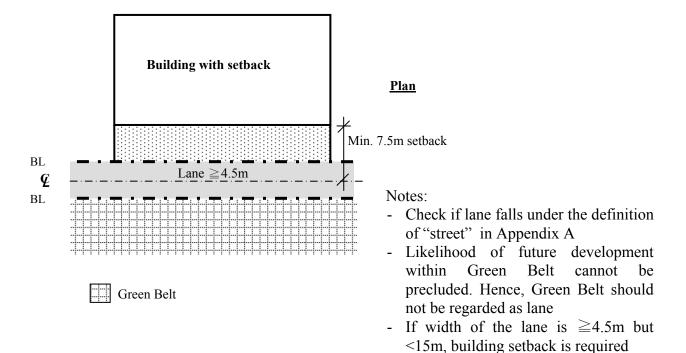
Example (1) of Building Setback - Site abutting narrow lane with Green Belt beyond
